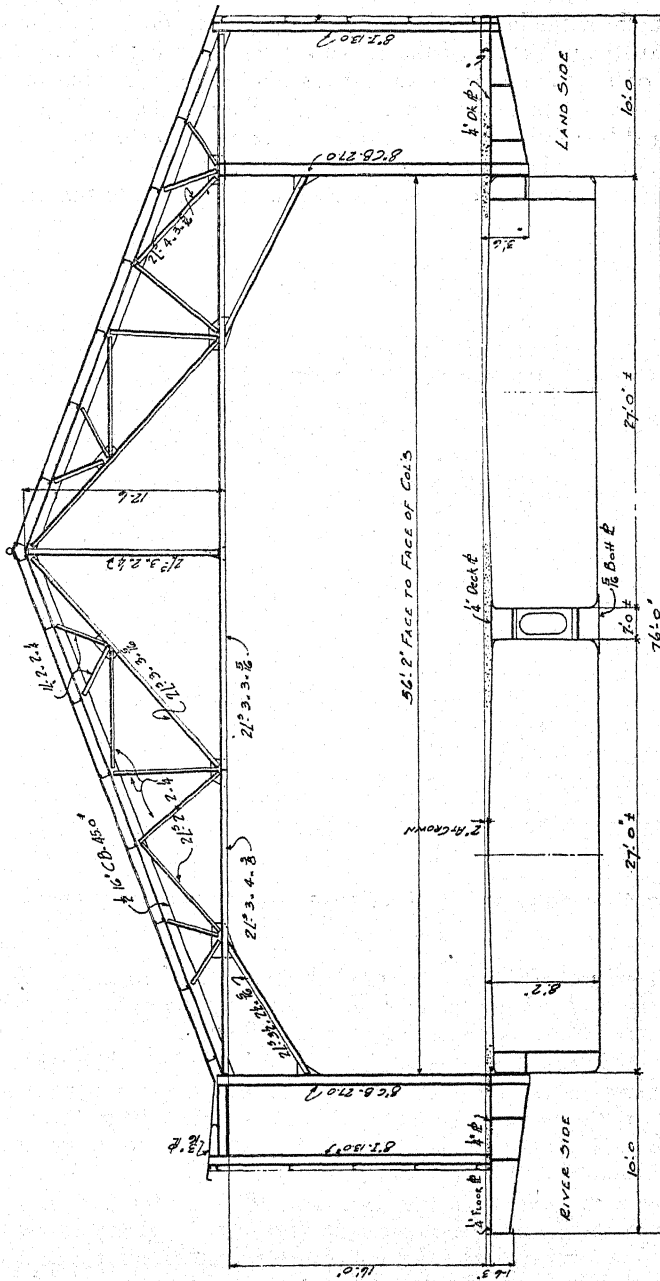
Typical transverse section of arc welded wharfbat.
